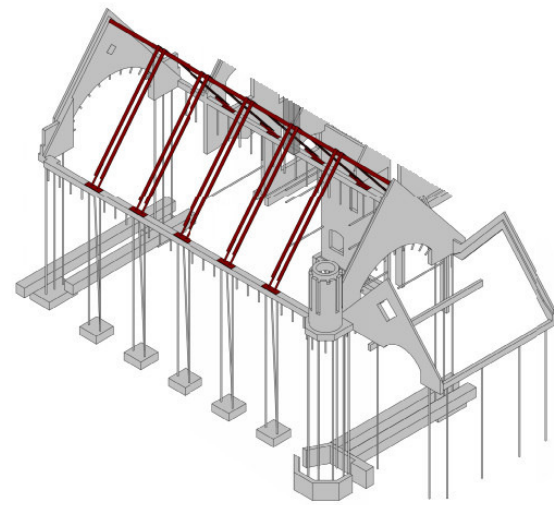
Revit model showing steel elements associated with plywood overlay strengthening of the Christchurch Arts Centre College Hall
